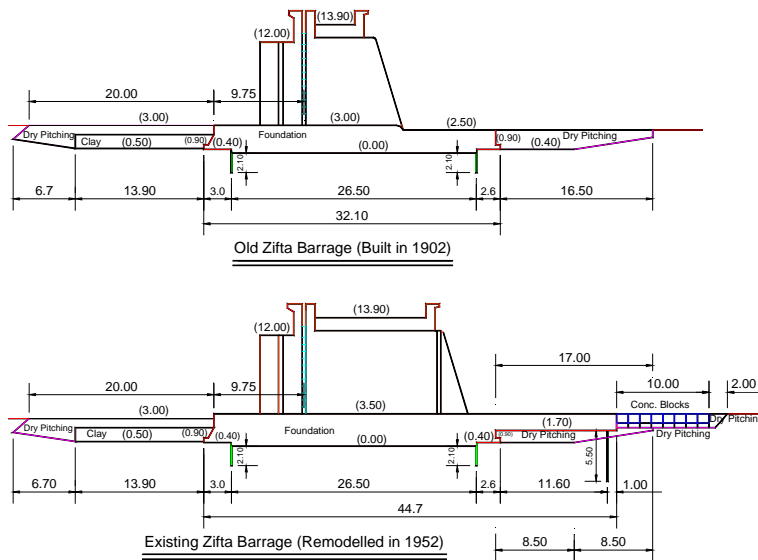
Longitudinal Cross Sections of Old and Existing Zifta Barrage
